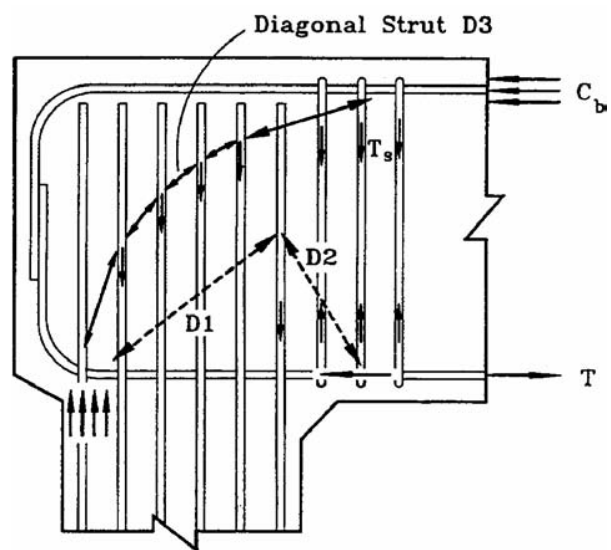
External Vertical Joint Reinforcement for Joint Force Transfer
